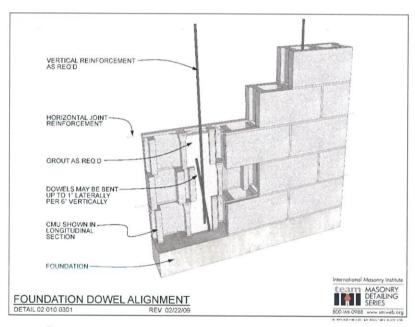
Placement of Vertical and Horizontal Reinforcement Source: International Masonry Institute (2009)
